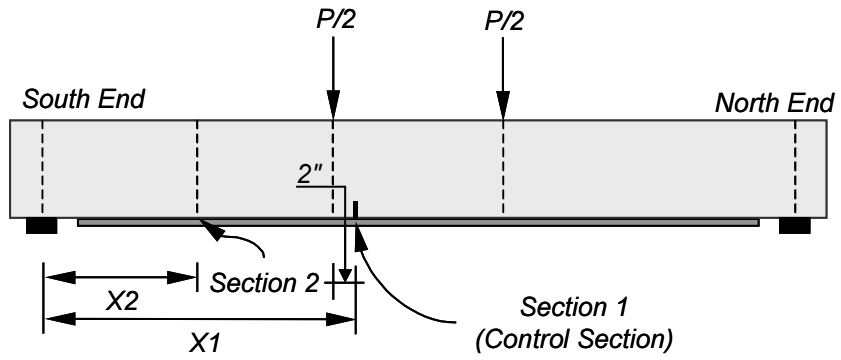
Position of Instrumented Sections for 8-in. by 16-in. Beams
